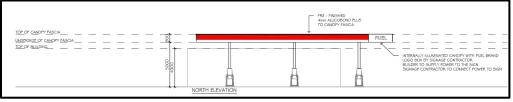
North Elevation facing Main Street - canopy with sales building behind (Source: DA007, dated 24/6/24)
